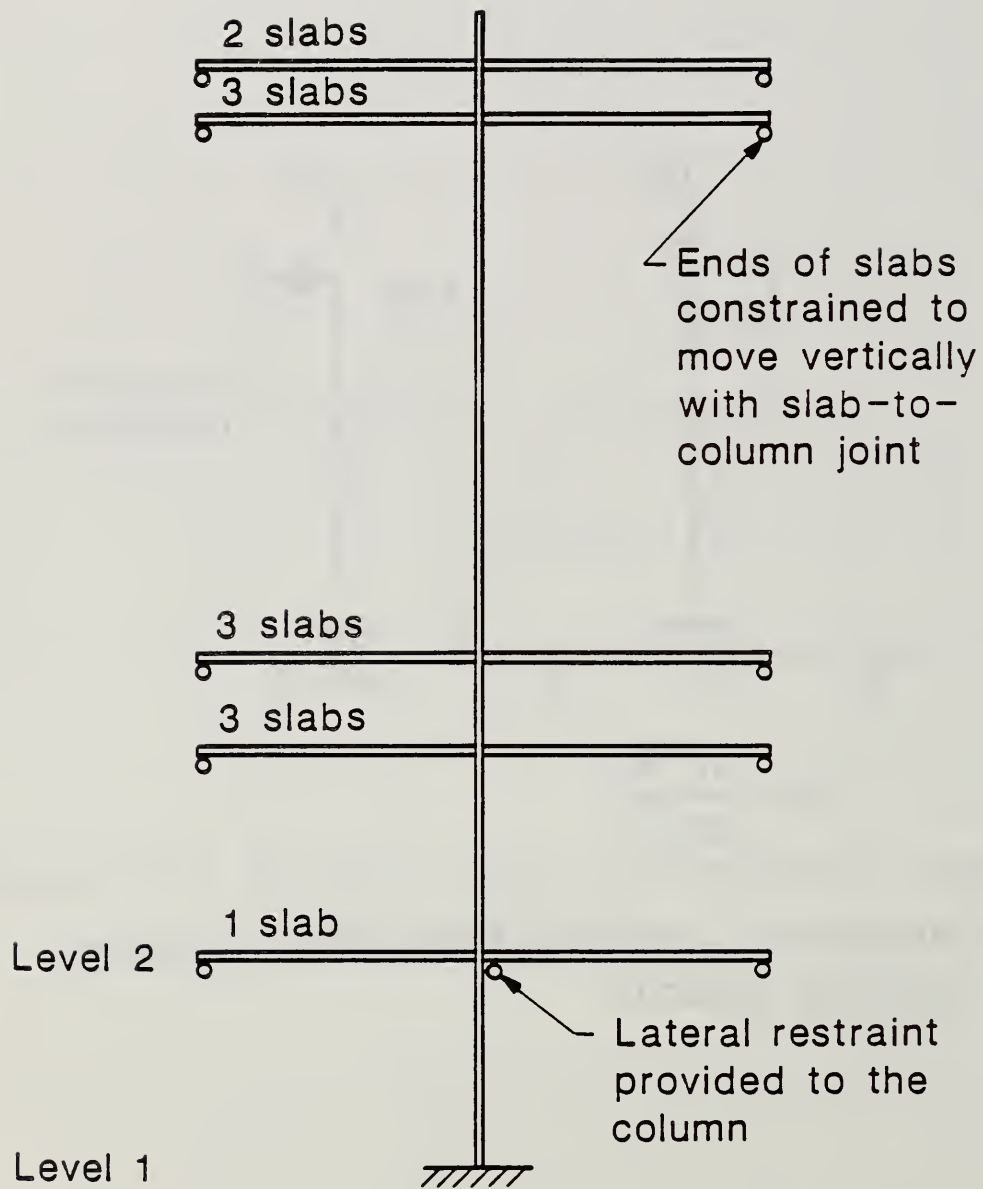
Single column computer model of West tower with slab restraining effects
